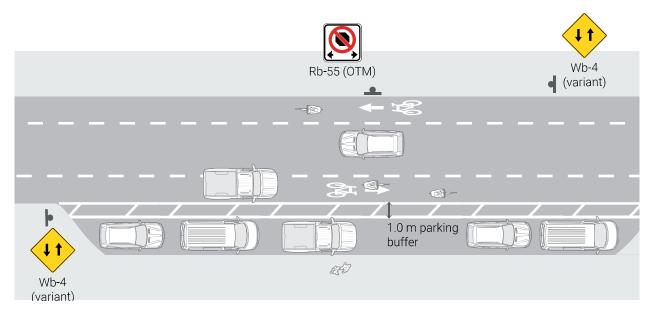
Advisory Bicycle Lanes on Urban Roadway with On-Street Parking
